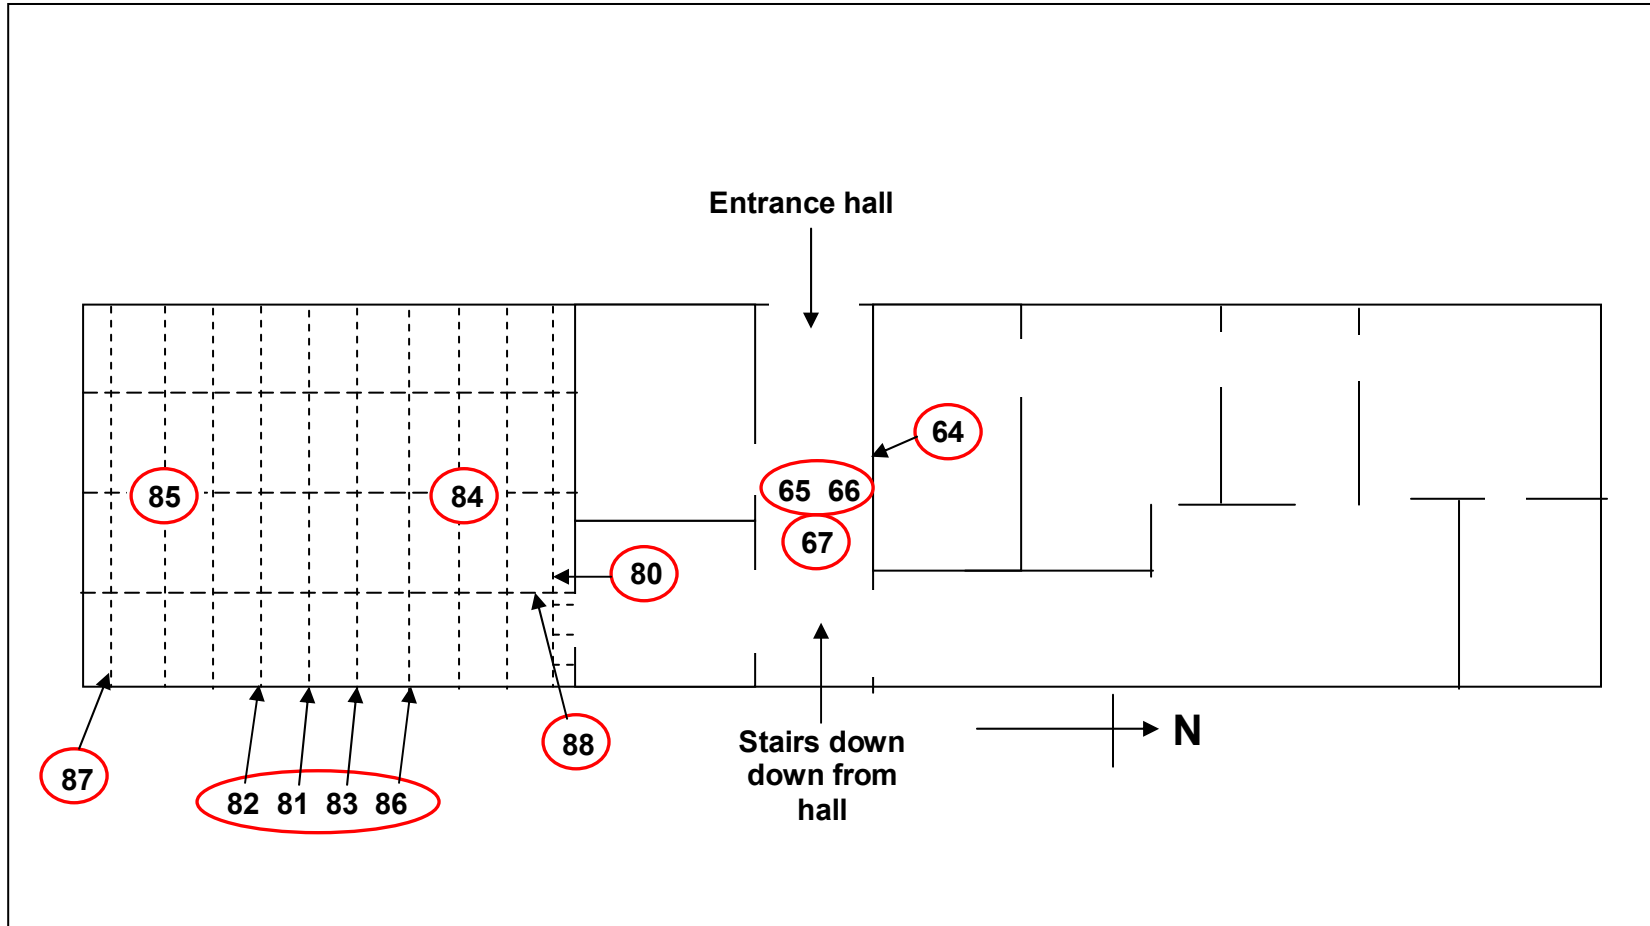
Simplified plan to show location of samples from the gable roofs
